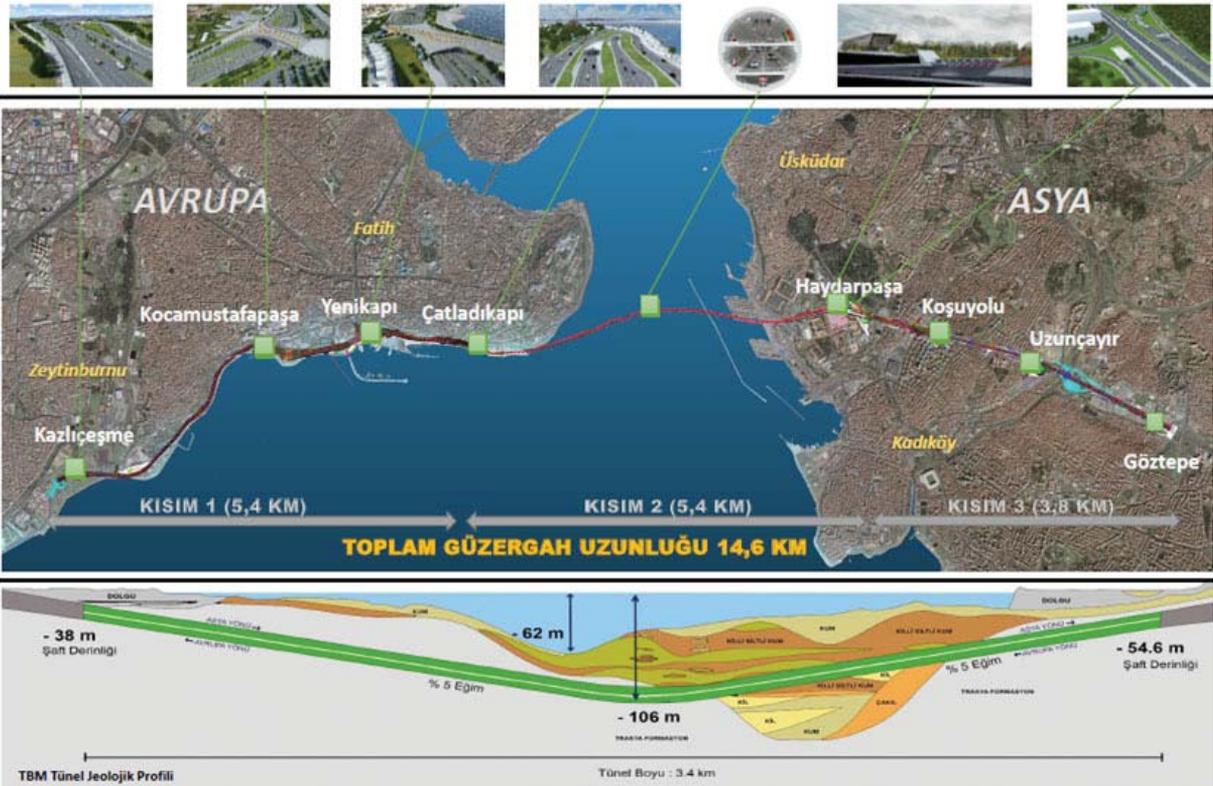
Istanbul Strait Road Tube Crossing Project – Eurasia Tunnel (AYGM)
